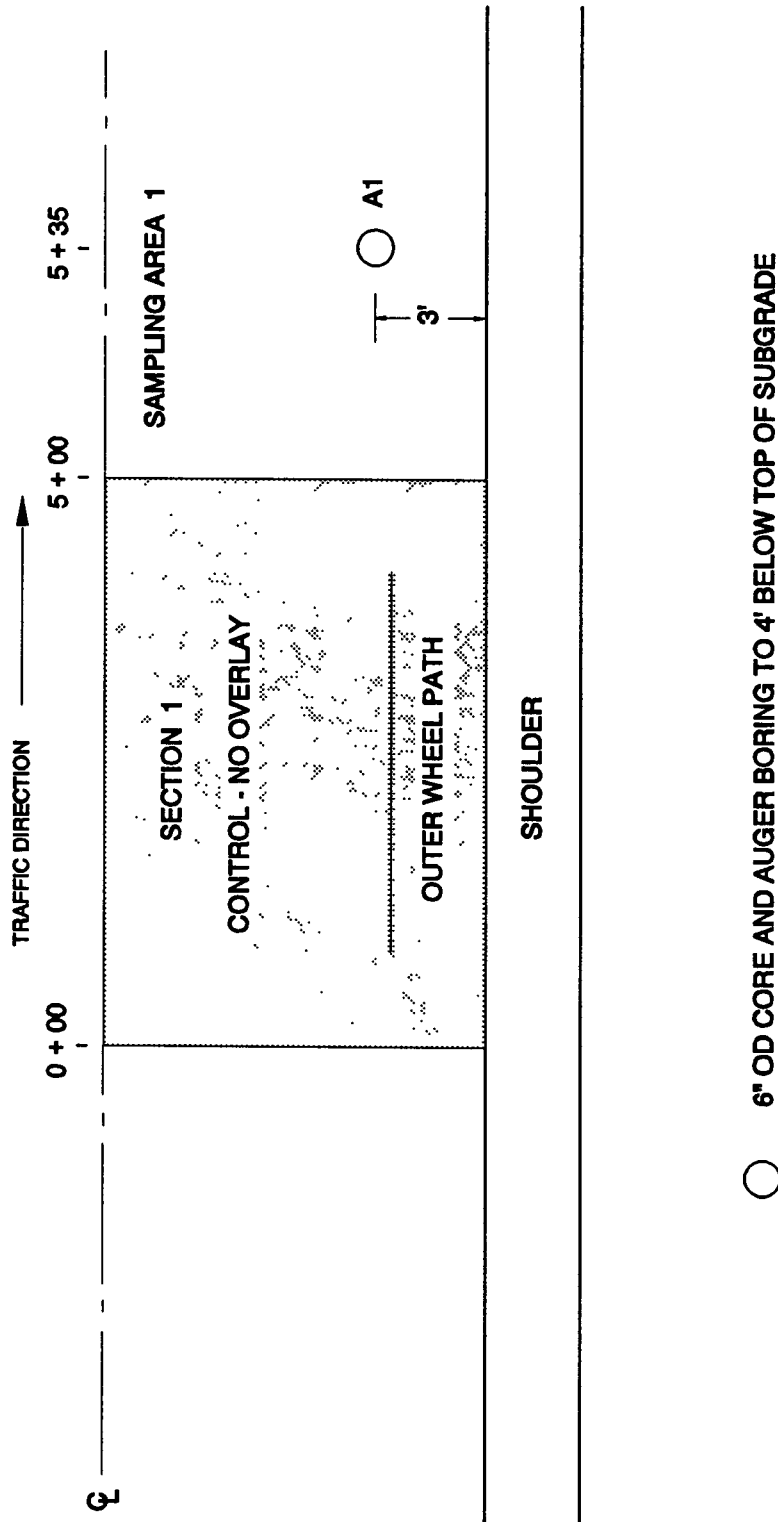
Example of "Pre-Construction" Sampling Plan for Test Section 1
